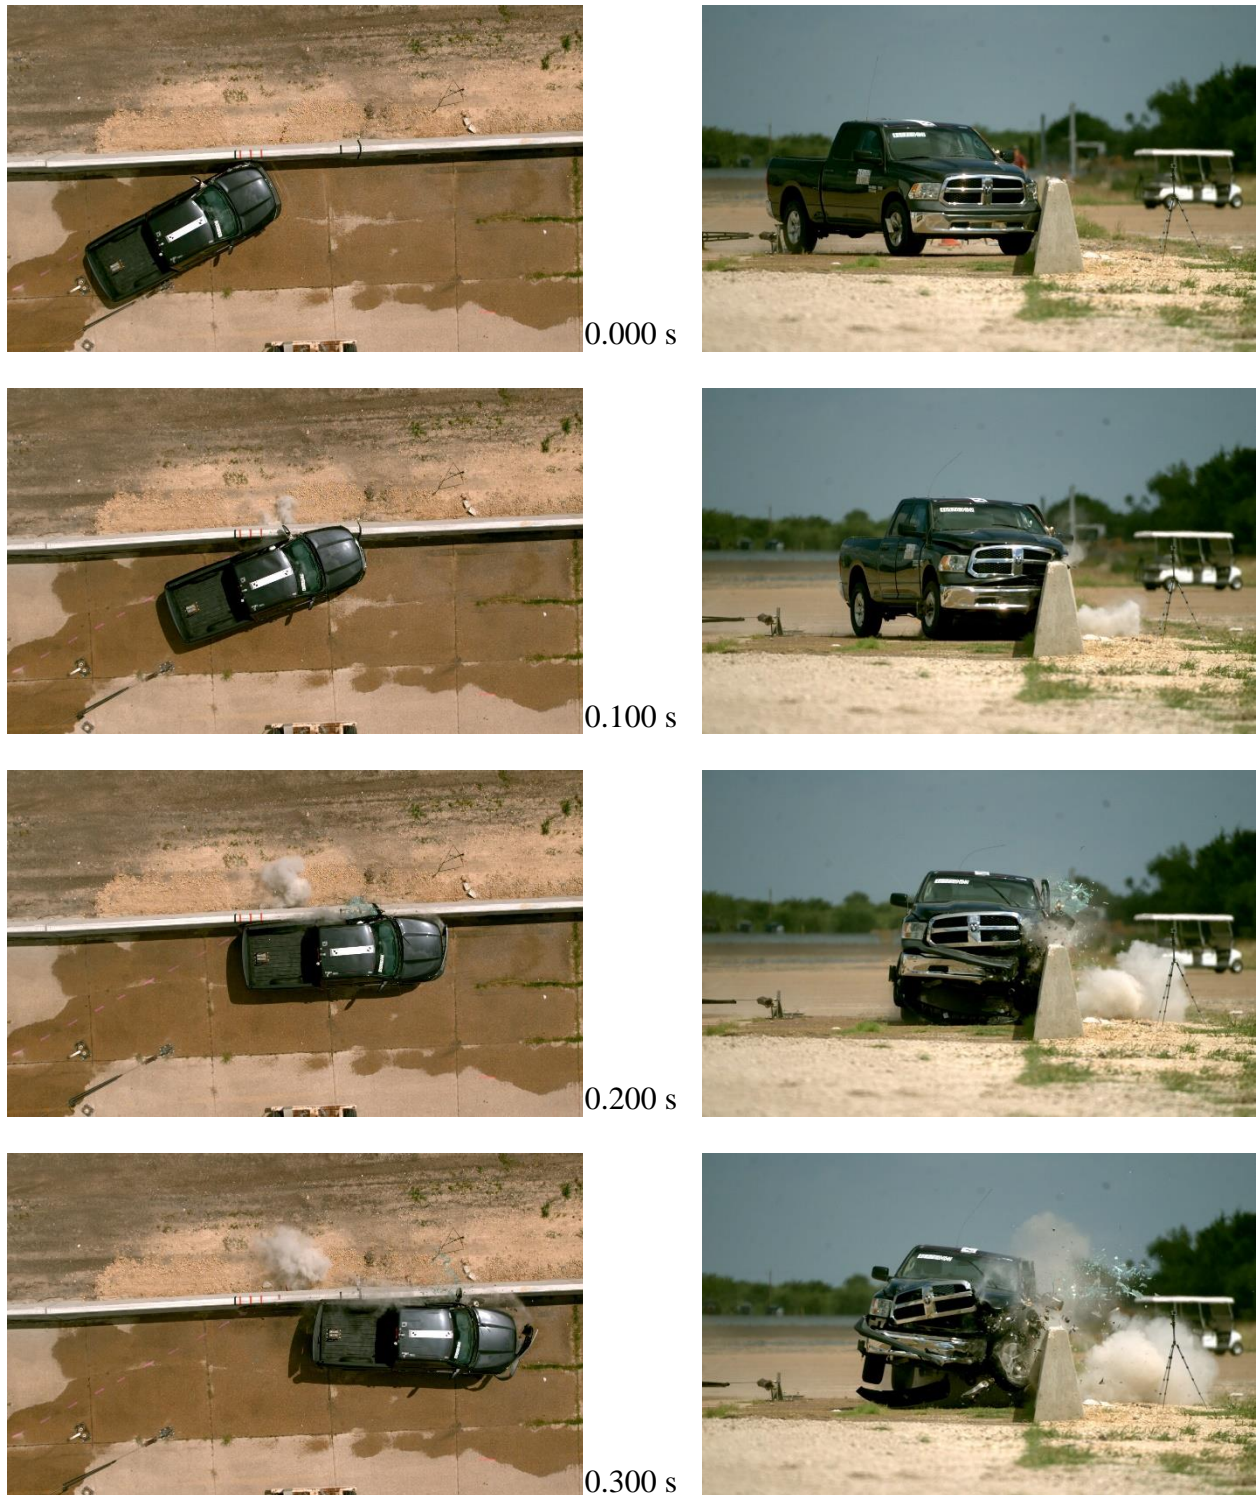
Sequential Photographs for Test No. 469760-06-2 (Overhead and Frontal Views).
